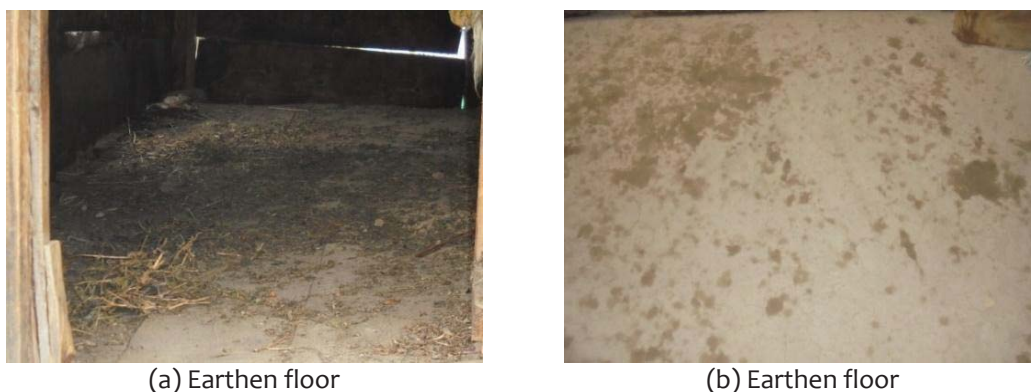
Mud/Earthen floors in rammed earth buildings
